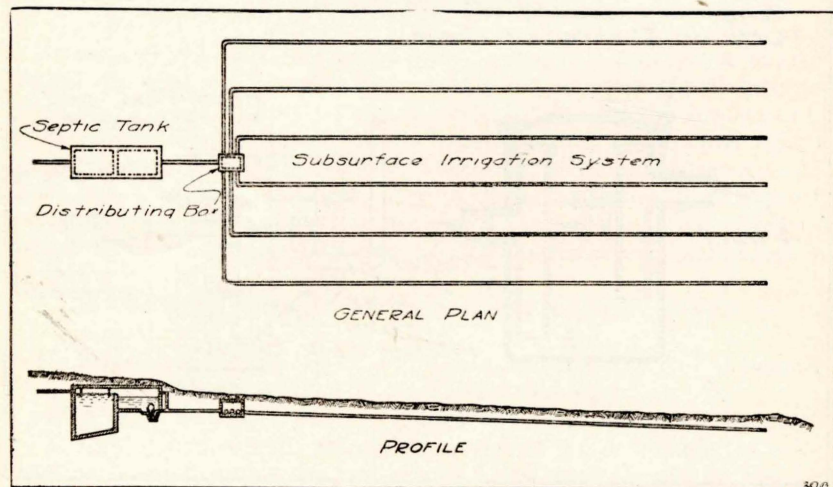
Typical Layout for a Residential Sewage Treatment Plant.
